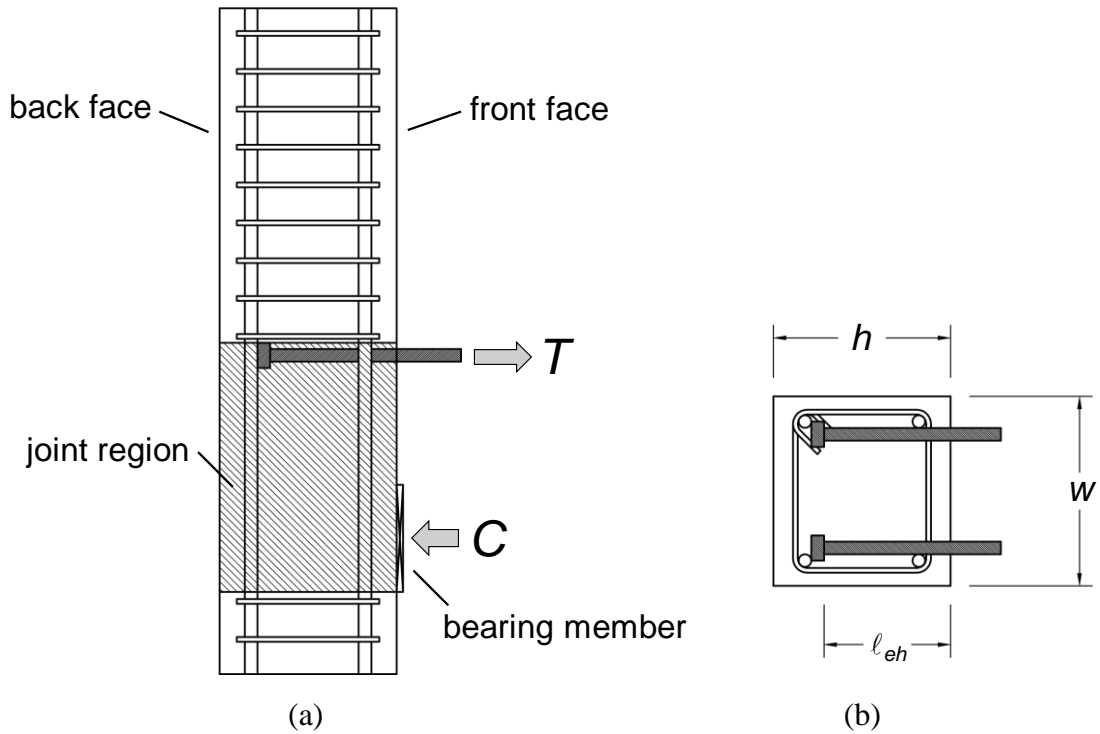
Typical beam-column joint specimen (a) side view, (b) top view
